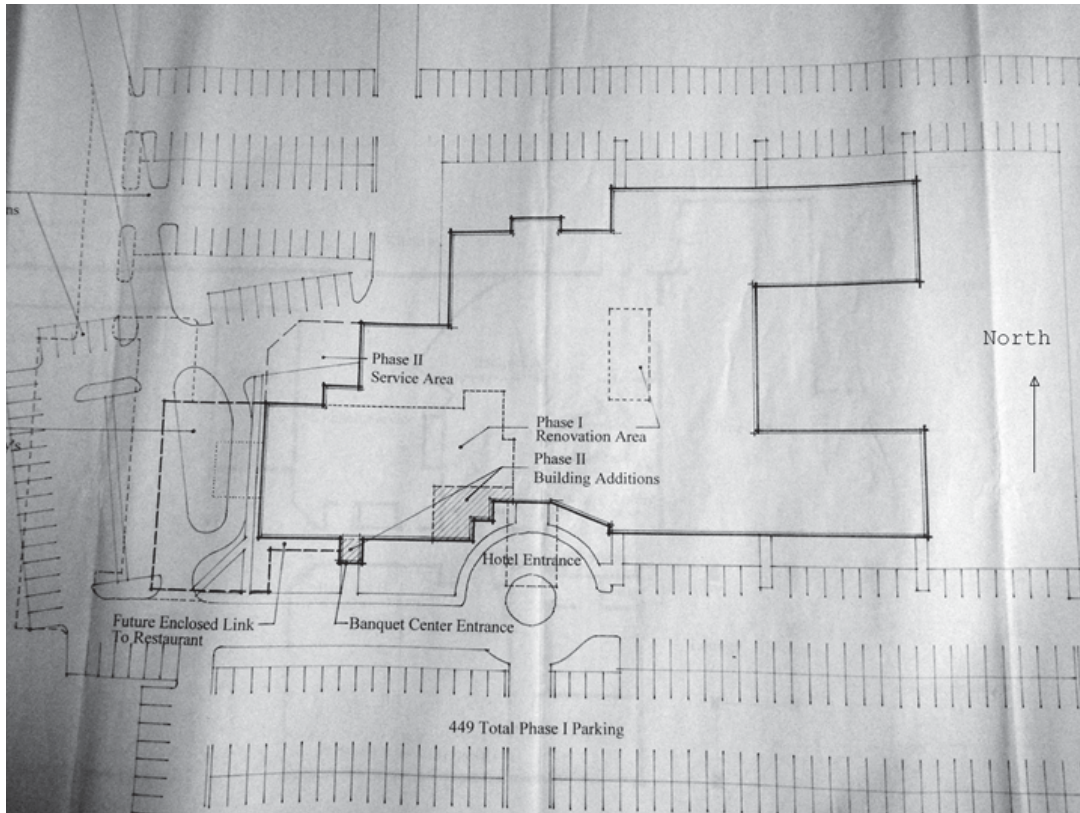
Planned T.G.I. Friday west end addition and other associated changes not built, August 25, 1994 (Building plans)
